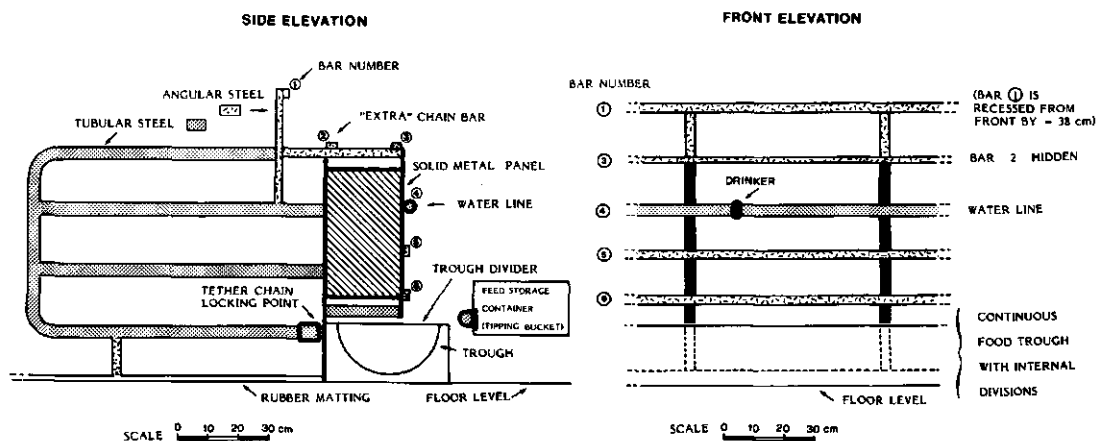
Constructional details of the dry-sow stalls, showing front and side elevations.
